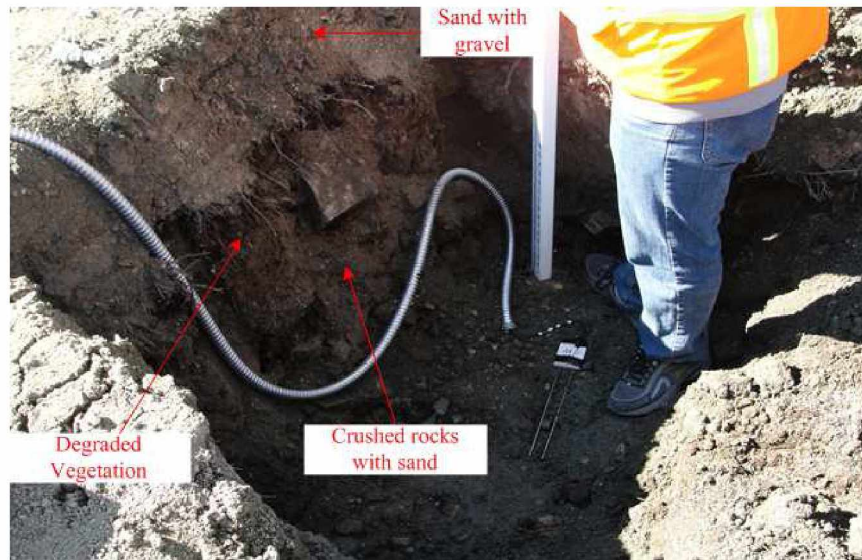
Excavation of Pit at Center of Road (Sensor 13)
